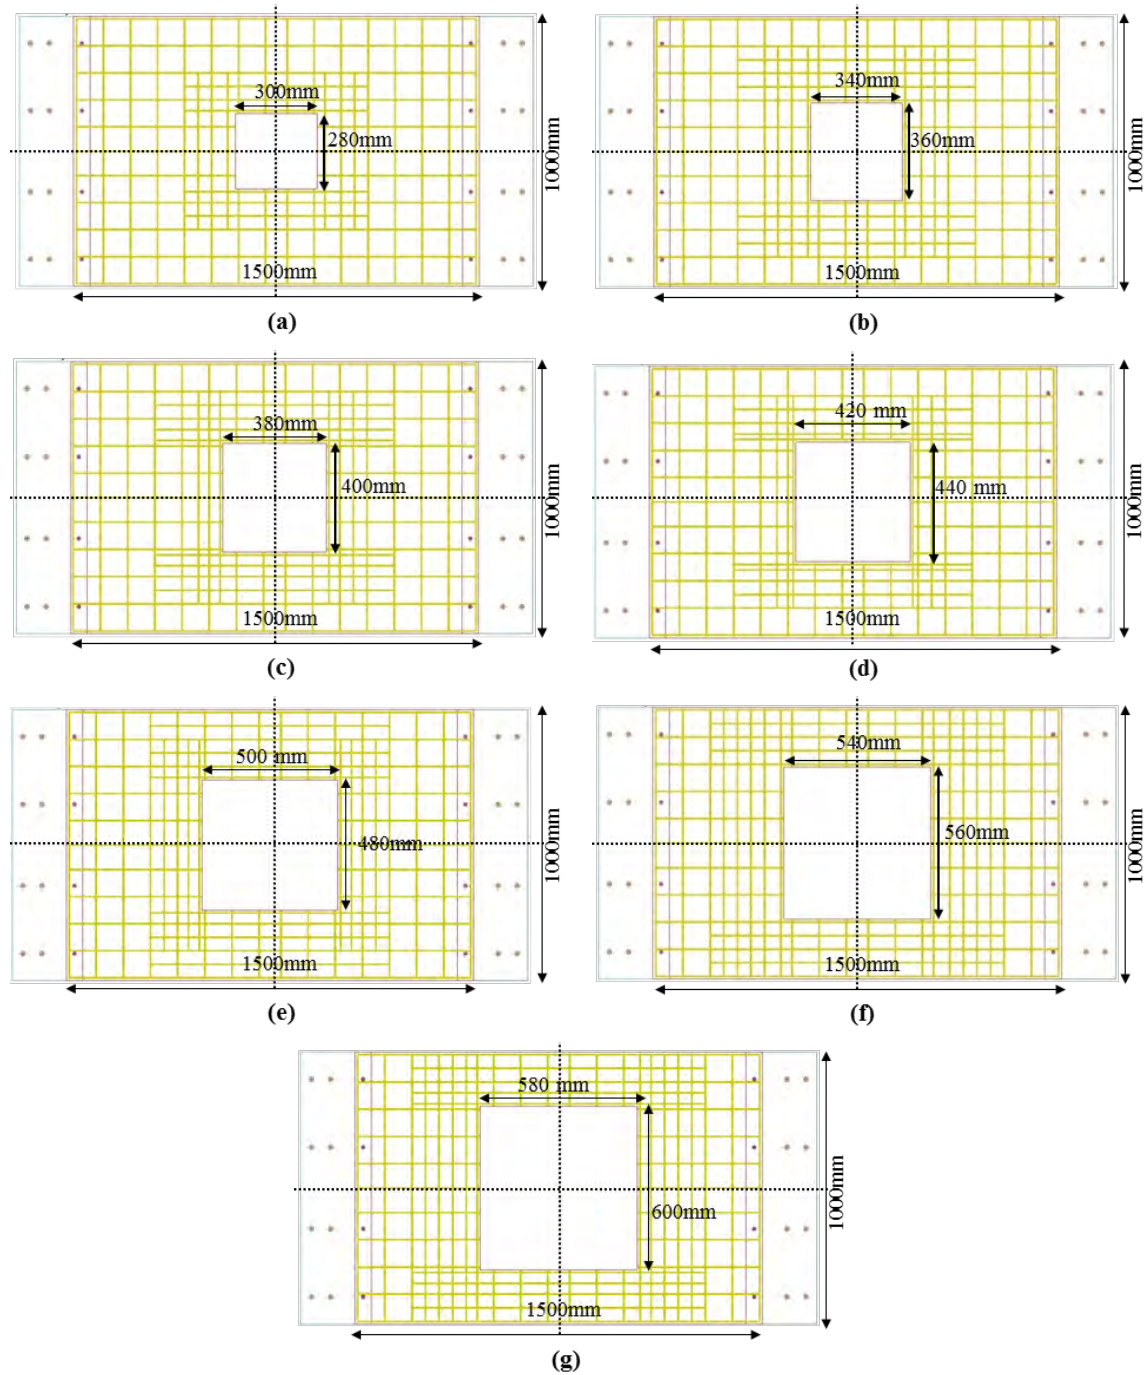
Details of opening sizes and reinforcement configuration-stiffened openings (rotated front view)
